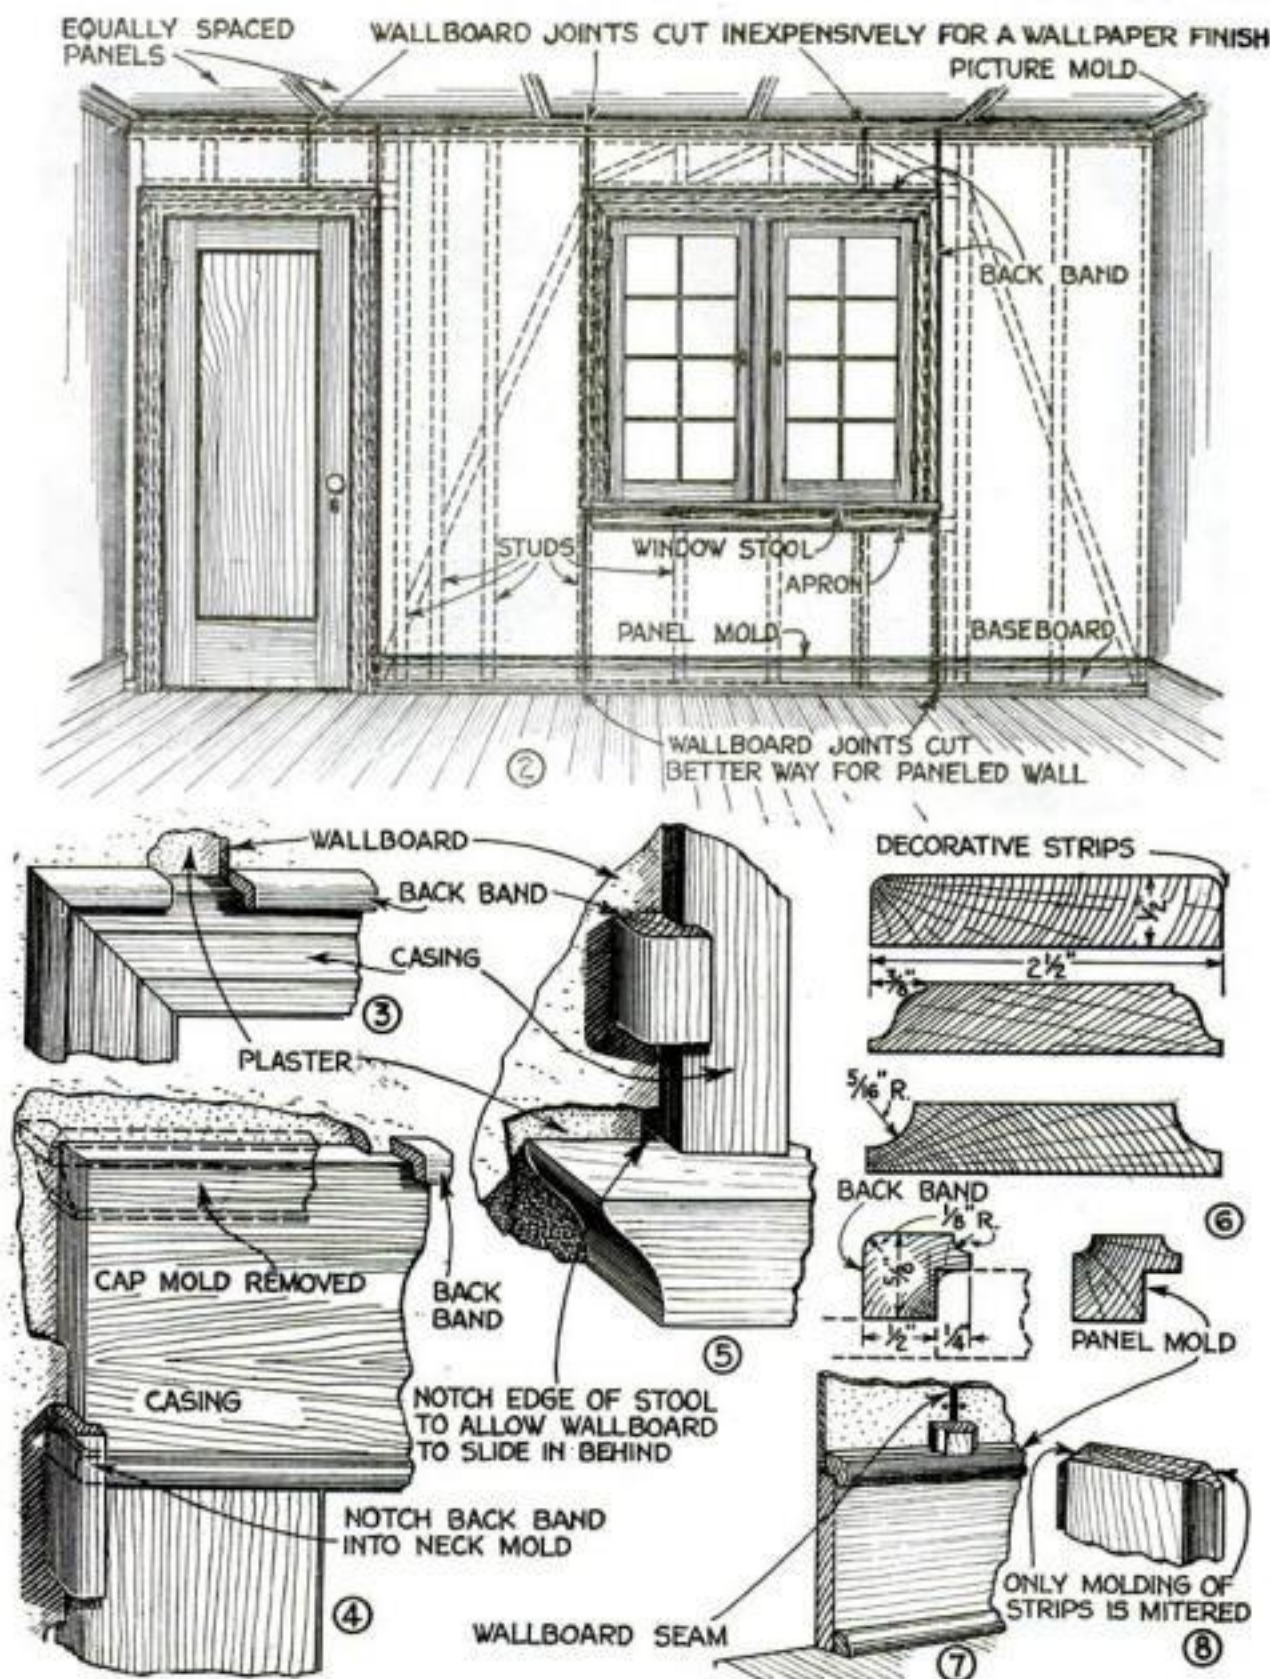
is a typical wall elevation. Figs. 3, 4, and 5 are details of the trim. Fig. 6 gives molding profiles. Fig. 7 illustrates the base. Fig. 8 shows the end of panel strip ready for joining
